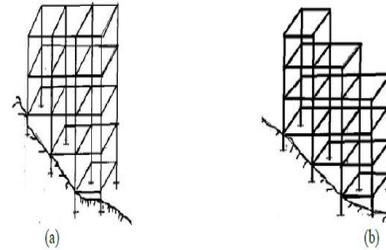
Hill building configurations: (a) Step back building; (b) Set back and Step back building
